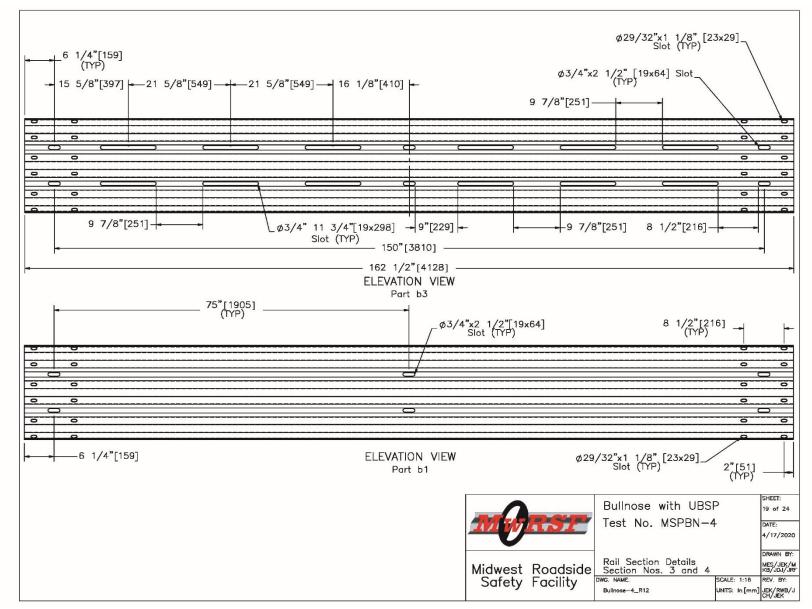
Rail Section Details Section Nos. 3 and 4, Test No. MSPBN-4
